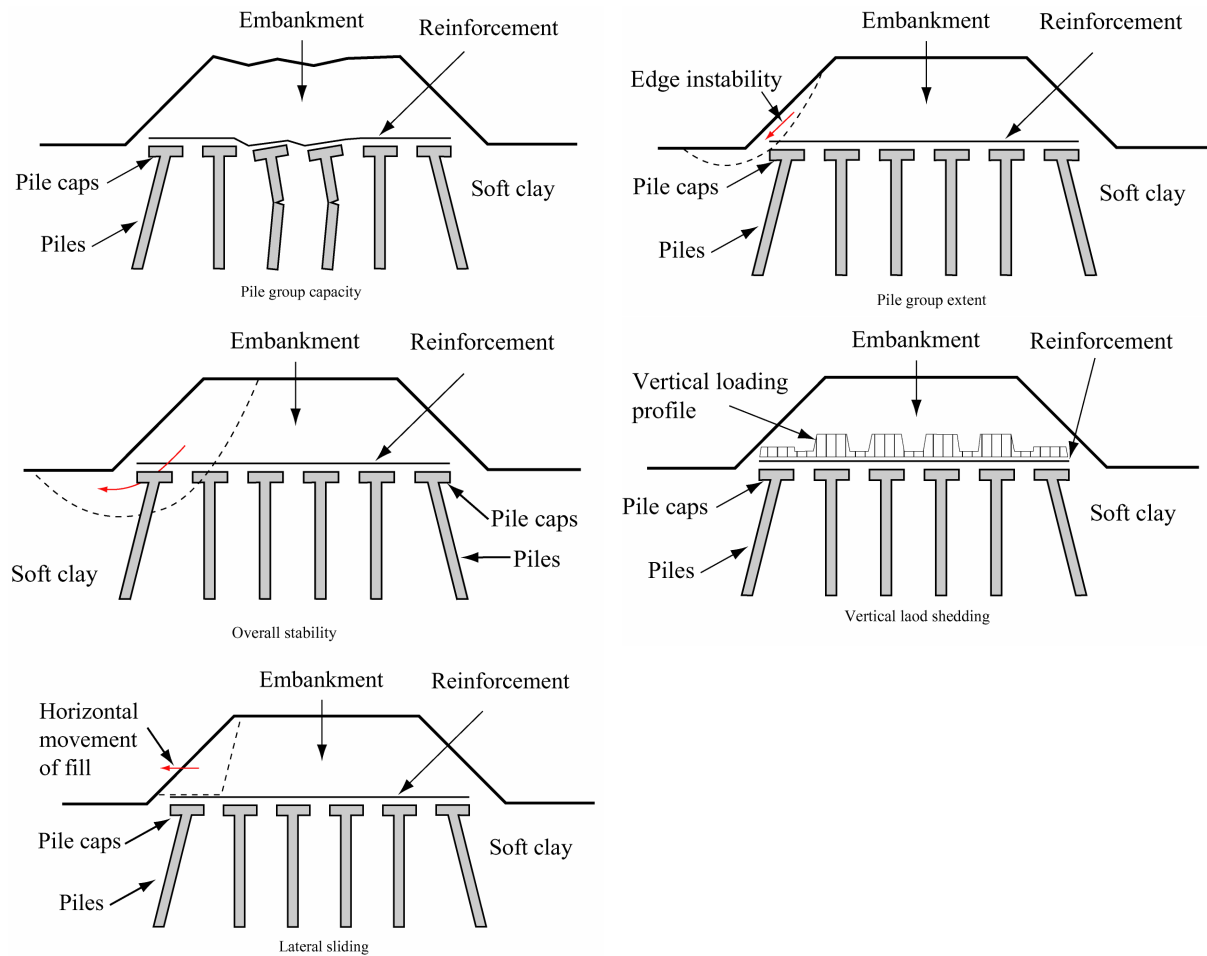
Ultimate Limit States for reinforced piled embankments.
